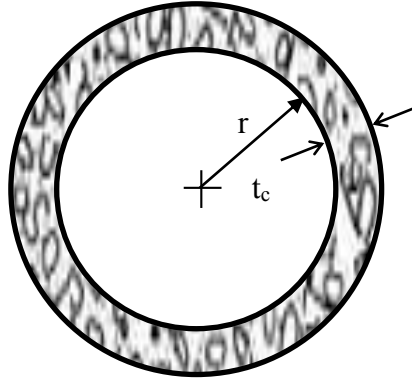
Concrete or shotcrete lining for a circular excavation.
